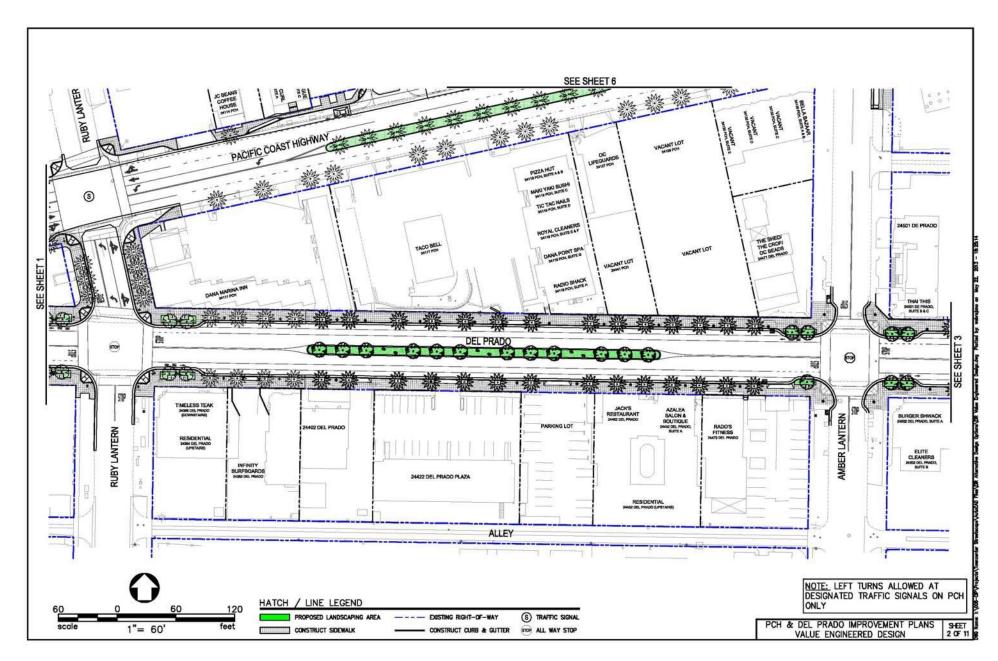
Del Prado Avenue - Ruby Lantern to Amber Lantern
